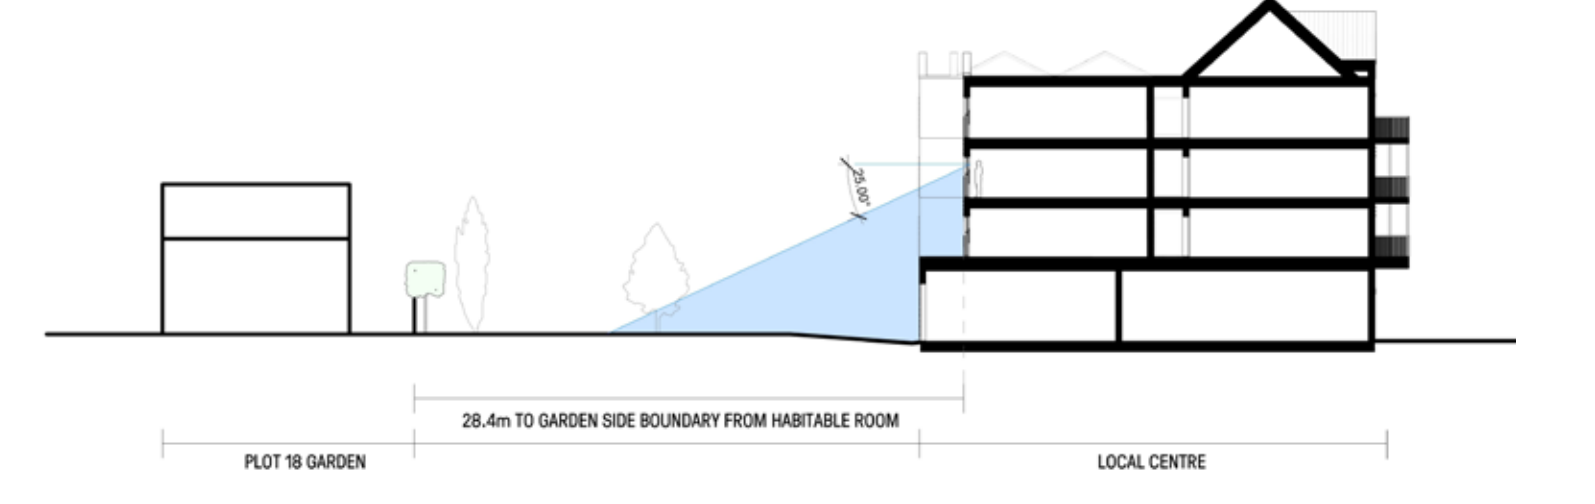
Local Centre & Plot 18 Second Floor Privacy Section post Design Workshop/Update
